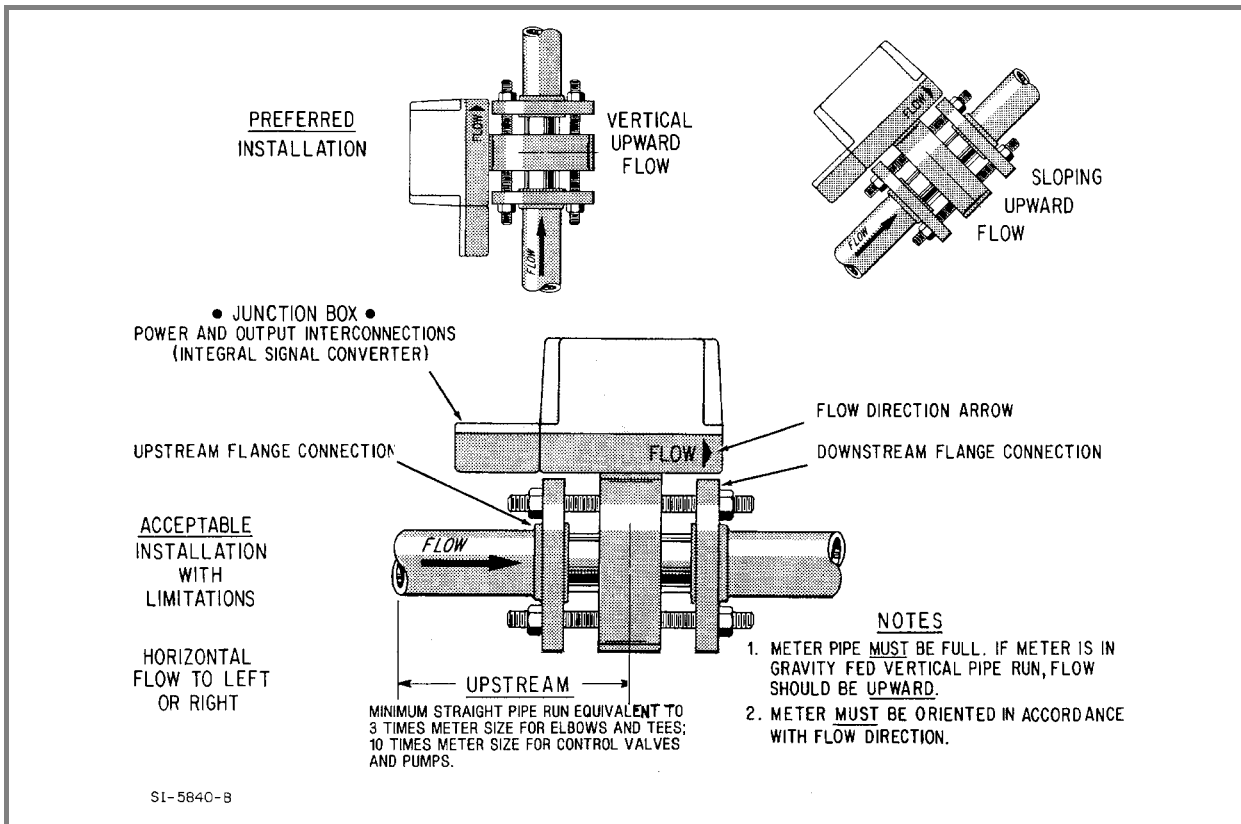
RECOMMENDED PIPING ARRANGEMENT
